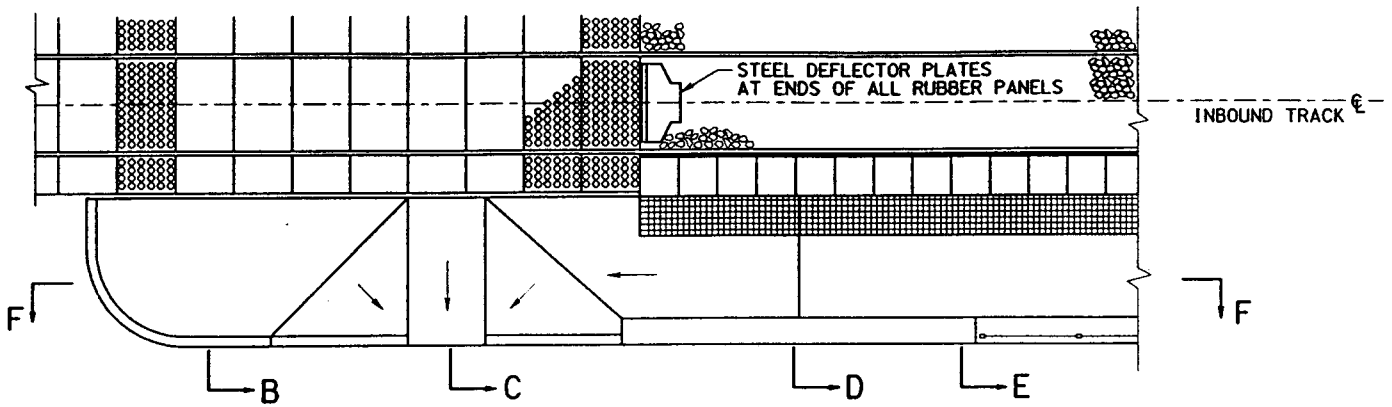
Typical Platform End Plan without Level Landing Space
